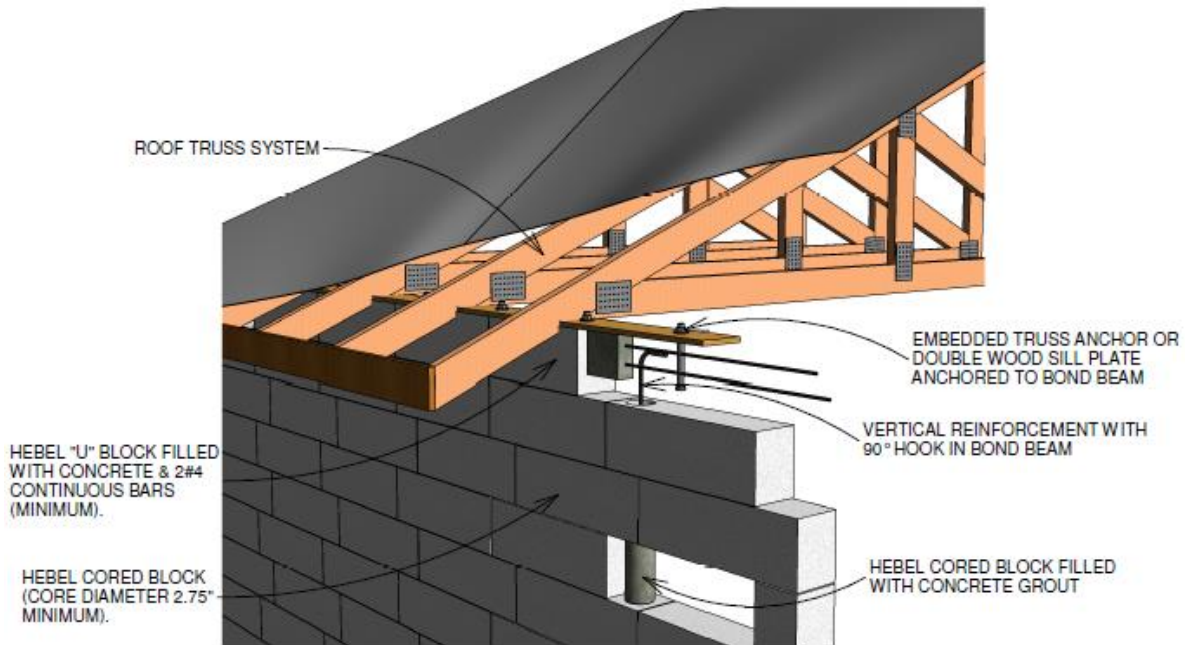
HEBEL MASONRY – SECTION @ TOP OF WALL
